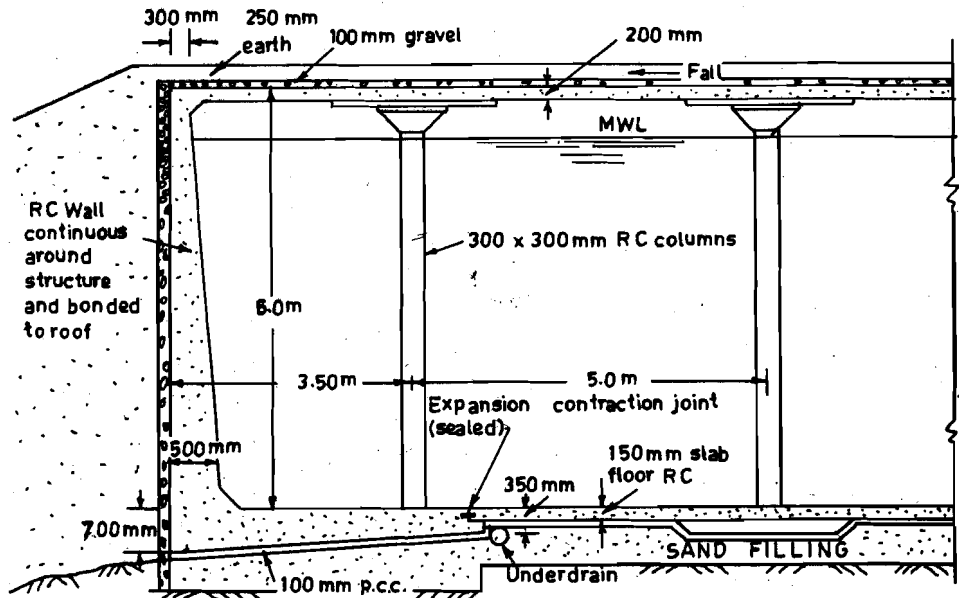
Cross-section of a Small R.C.C. Distribution Reservoir with Flat Roof and Floor
